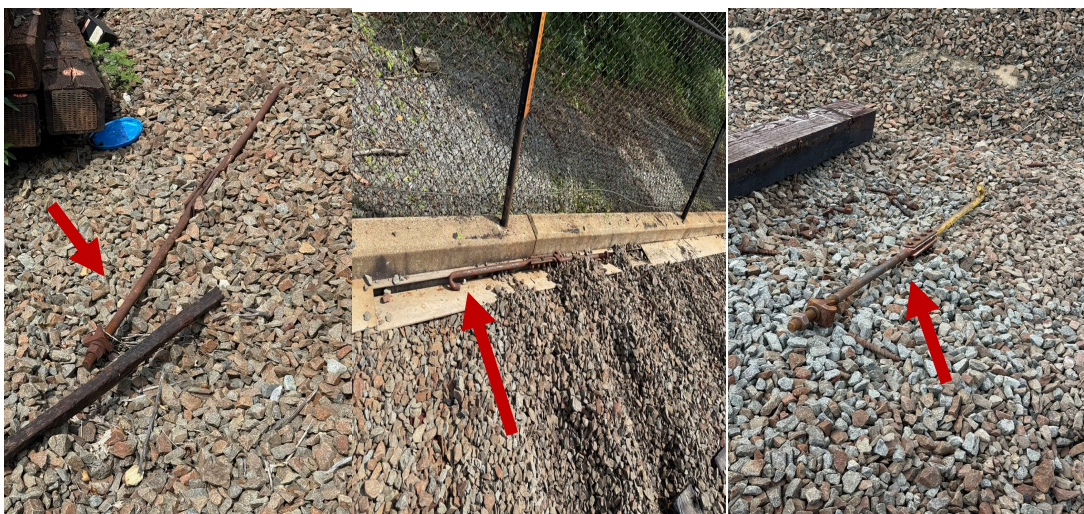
(left) and Photo 2 (right): Photo 1 shows the installed gauge rod at K2 512+90. Photo 2 shows the installed gauge rod at K2 513+90.
